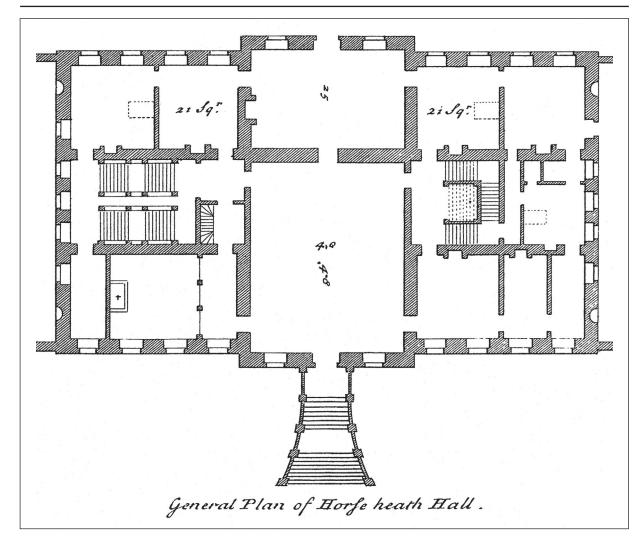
Plan of the first or principal story from Vitruvius Britannicus.
